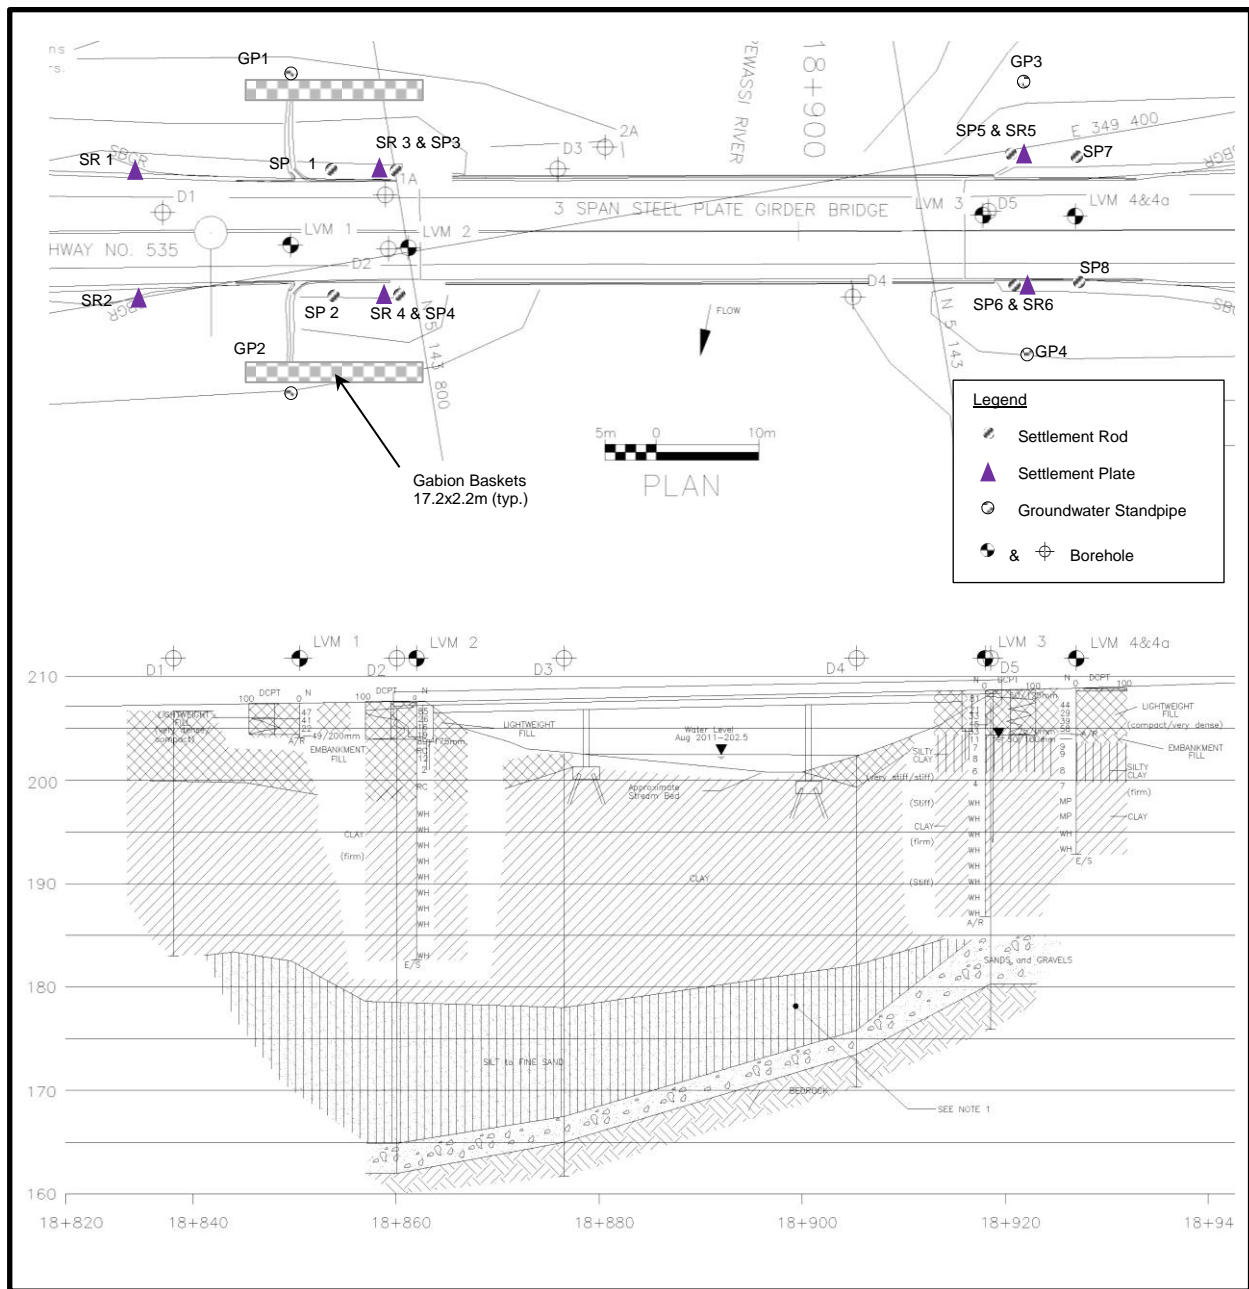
Borehole & Instrumentation Layout Plan and Soil Stratigraphy
